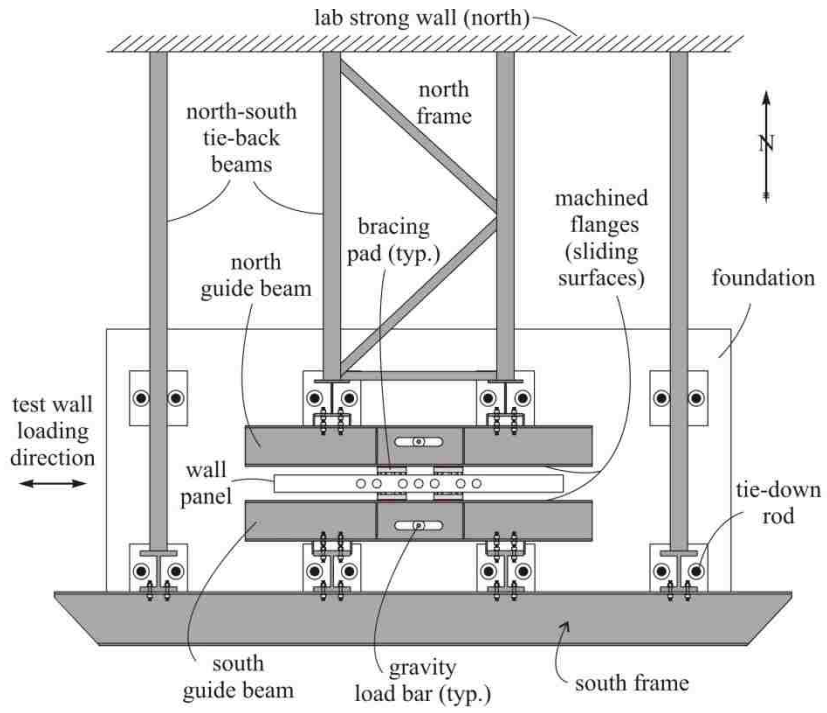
Out-of-plan Bracing (Perez et al. 2004)
